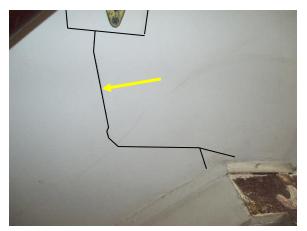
Cracking originating at the handrail connection in stairwell. Crack traced for clarity.
